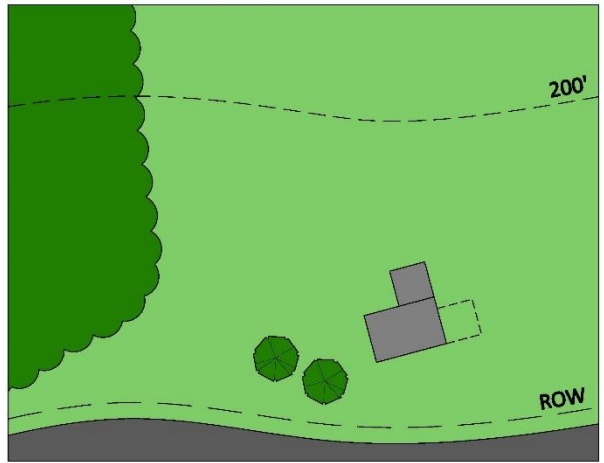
Addition to existing structure is placed to the rear of the building rather than directly in the viewshed
